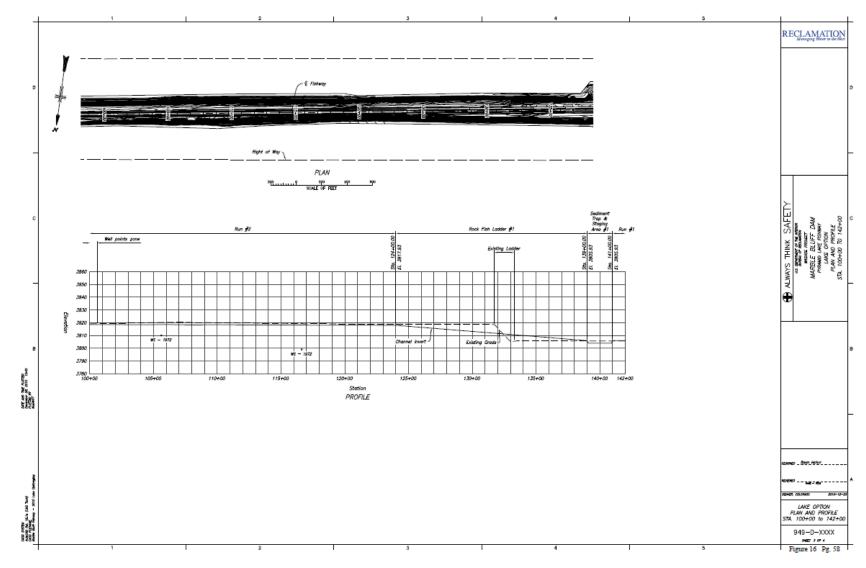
Lake fishway – plan and profile – station 100+00 to 142+00
